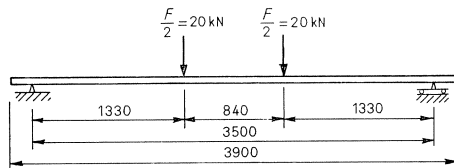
Loading arrangement on model beam. (dimensions in mm).
